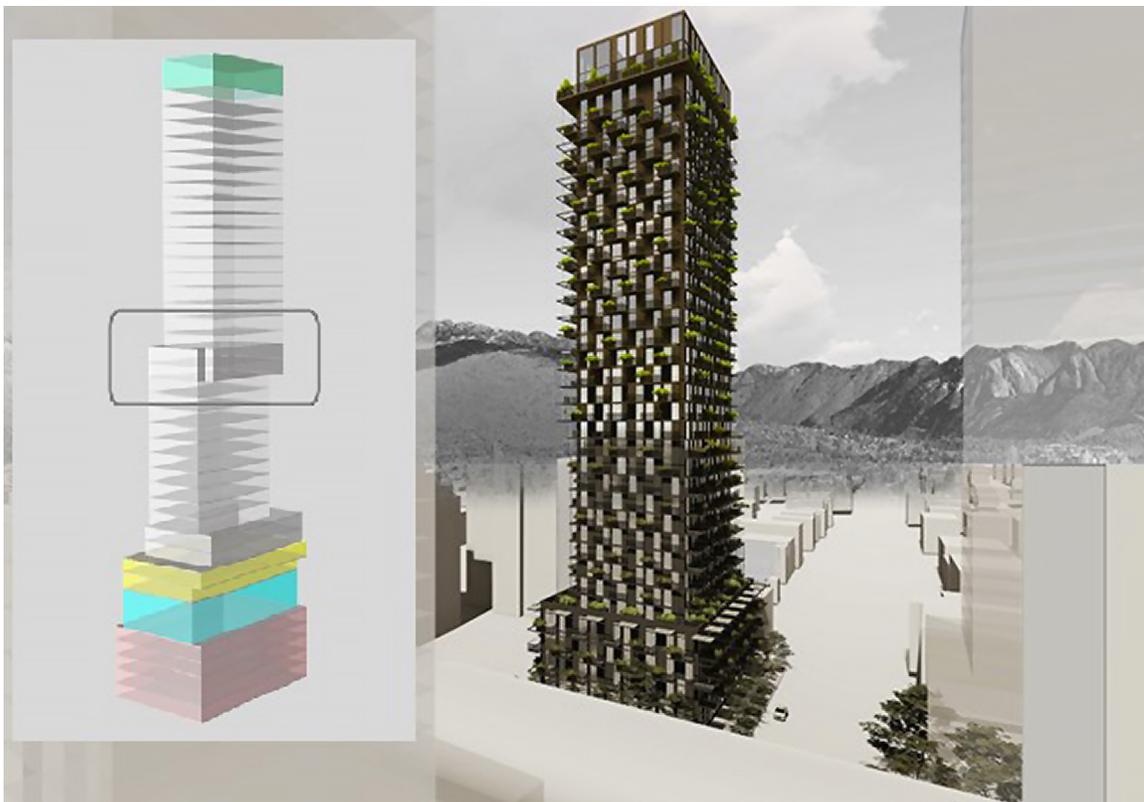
Residential tower design impression. Inset: proposed tower shift.
